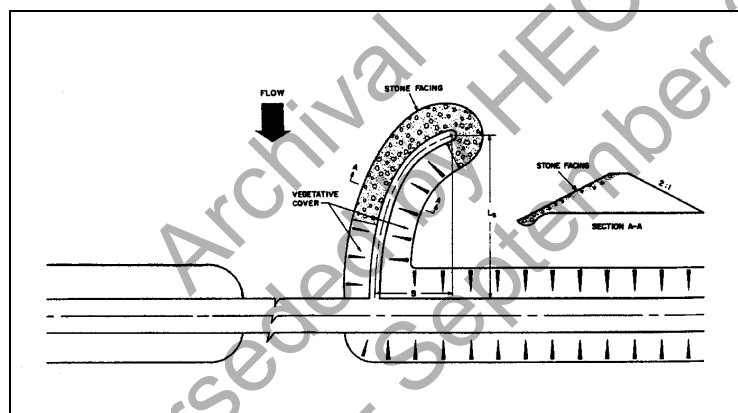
Typical guide bank layout and section (after Bradley).⁽⁵⁾
